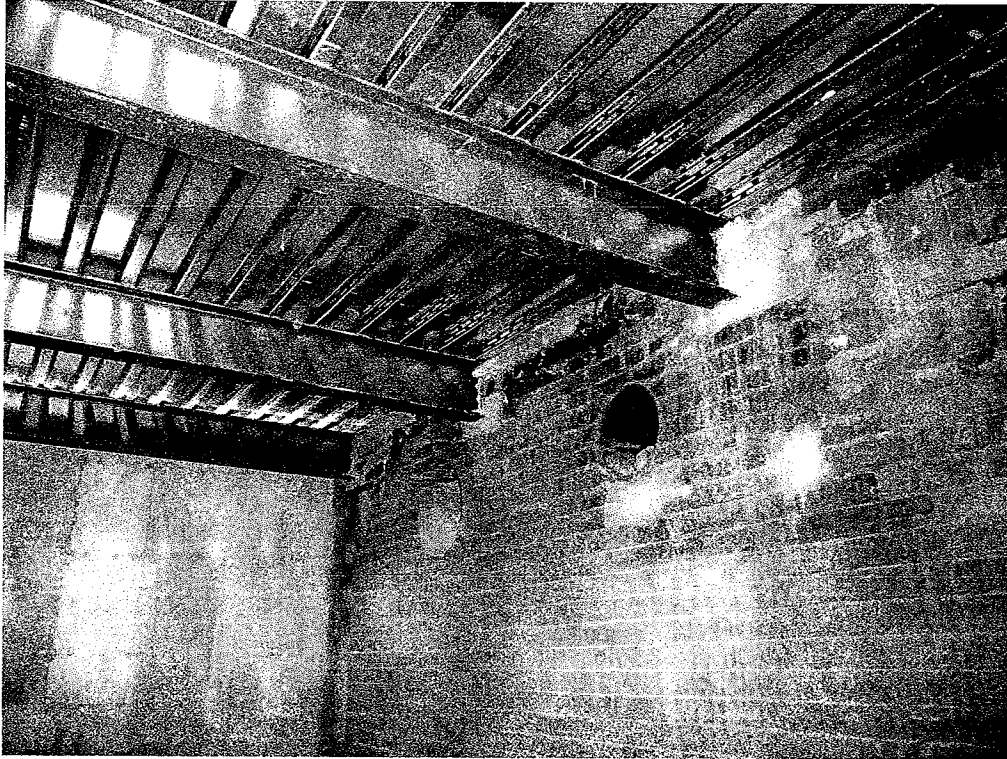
Steel beams at Rear entrance with beam pockets mortared solid.
